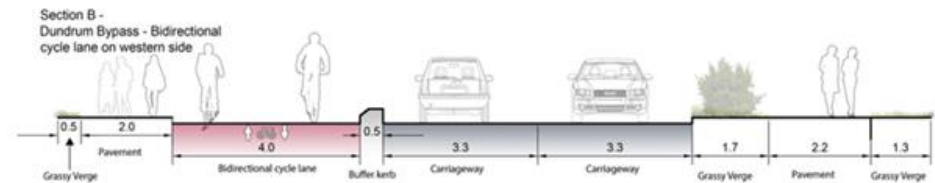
Dundrum Bypass Proposed Cross-Section
